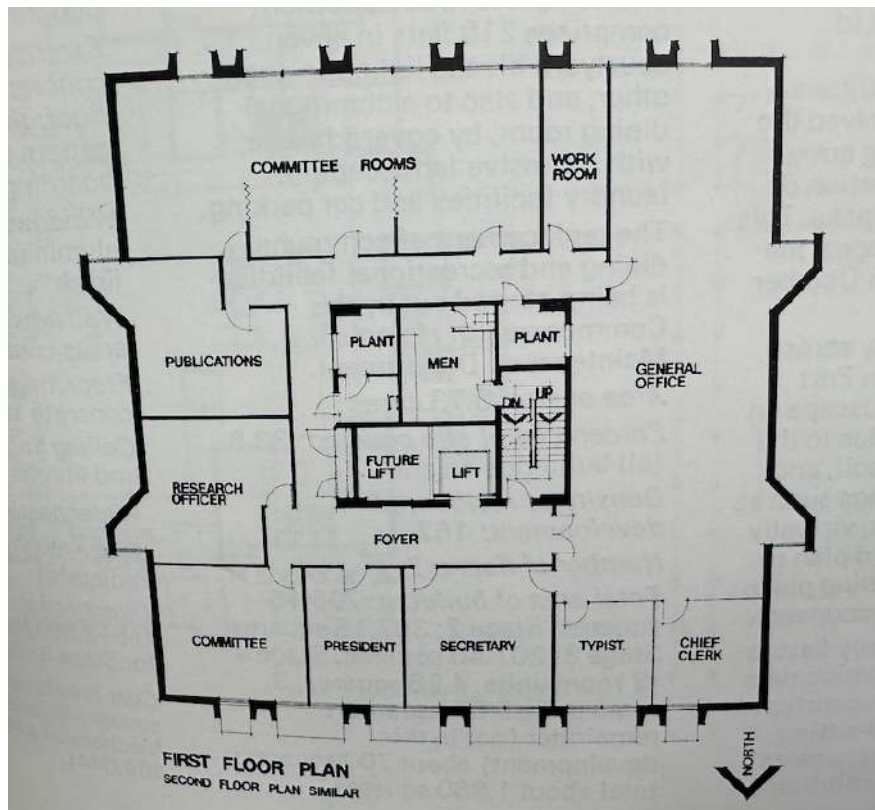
Raggatt House, first floor plan, 1971 [Source: RAIA 1971:831]; similar layout for second floor
